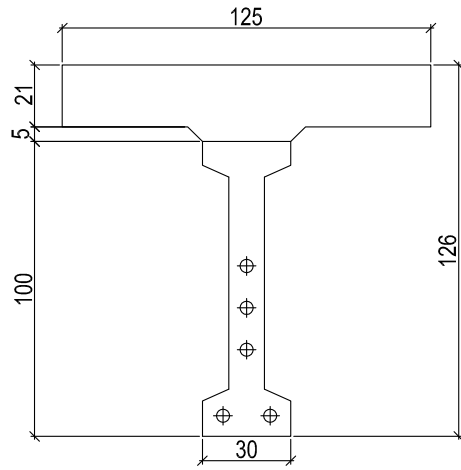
Cross-section of the casted girder (dimensions in [cm])
